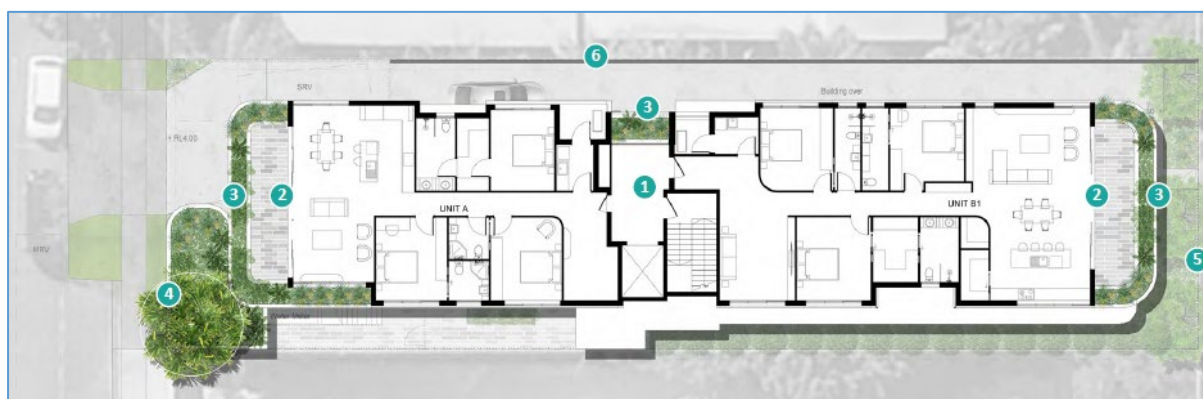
Proposed Landscape Concept Plan - Level 2 (Shepherd)
